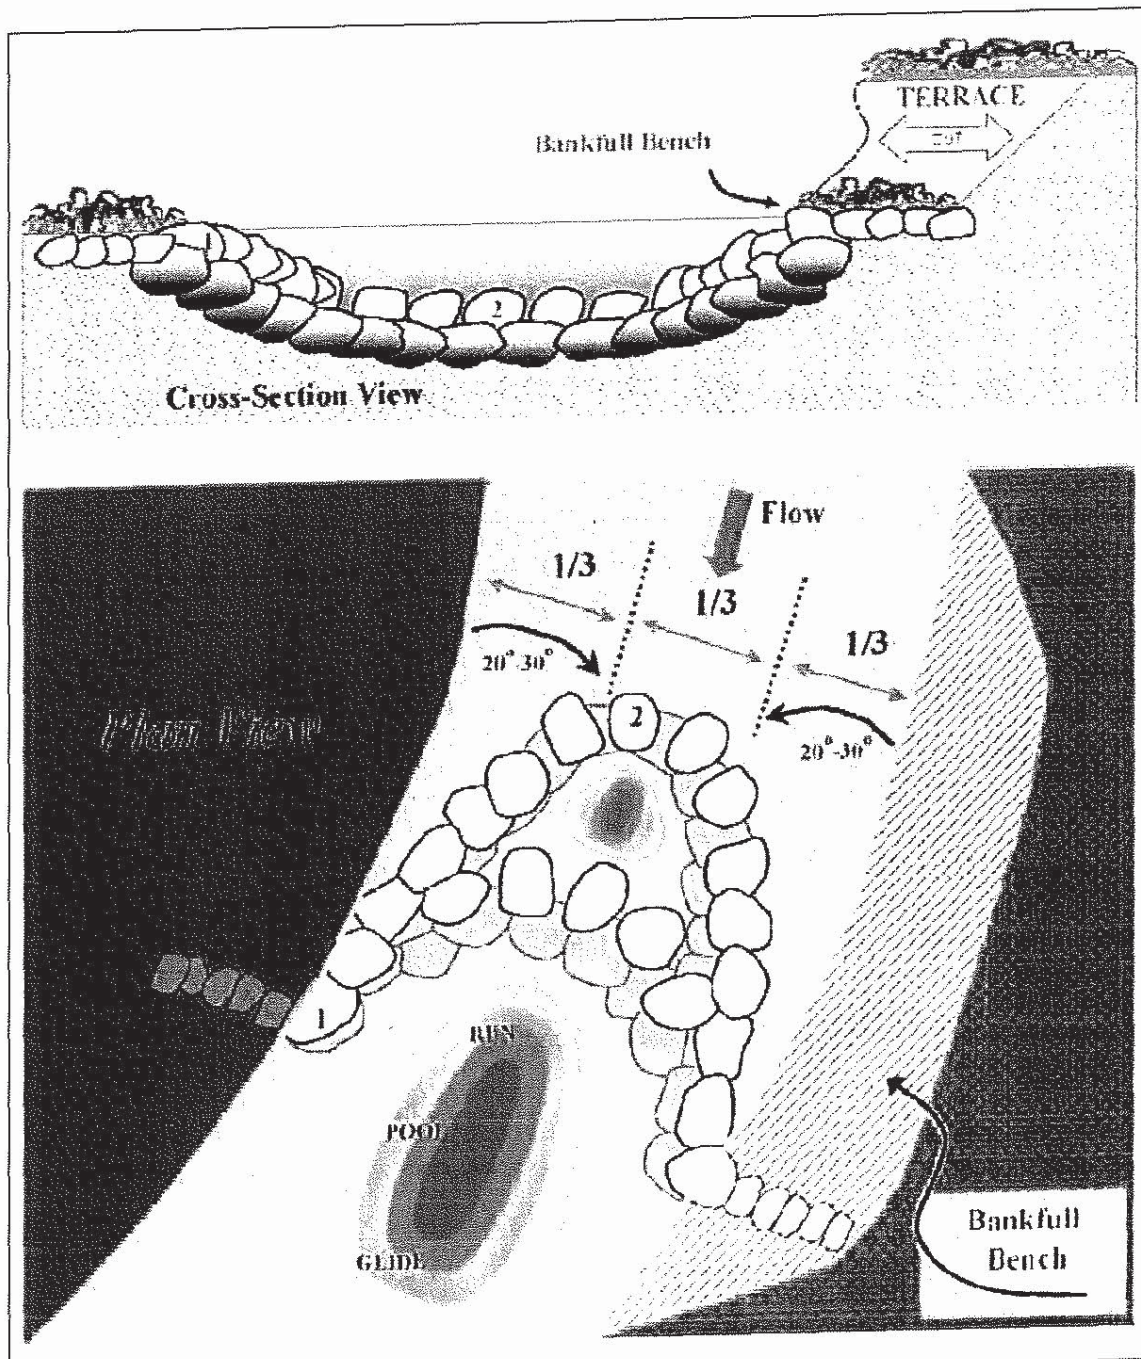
Boulder cross vane and constructed bankfull bench (NRCS, 2007).
